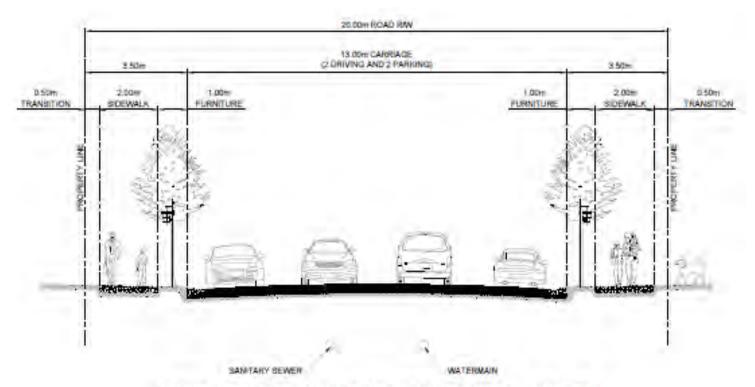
TOWN CENTER STREET TYPICAL SECTION
